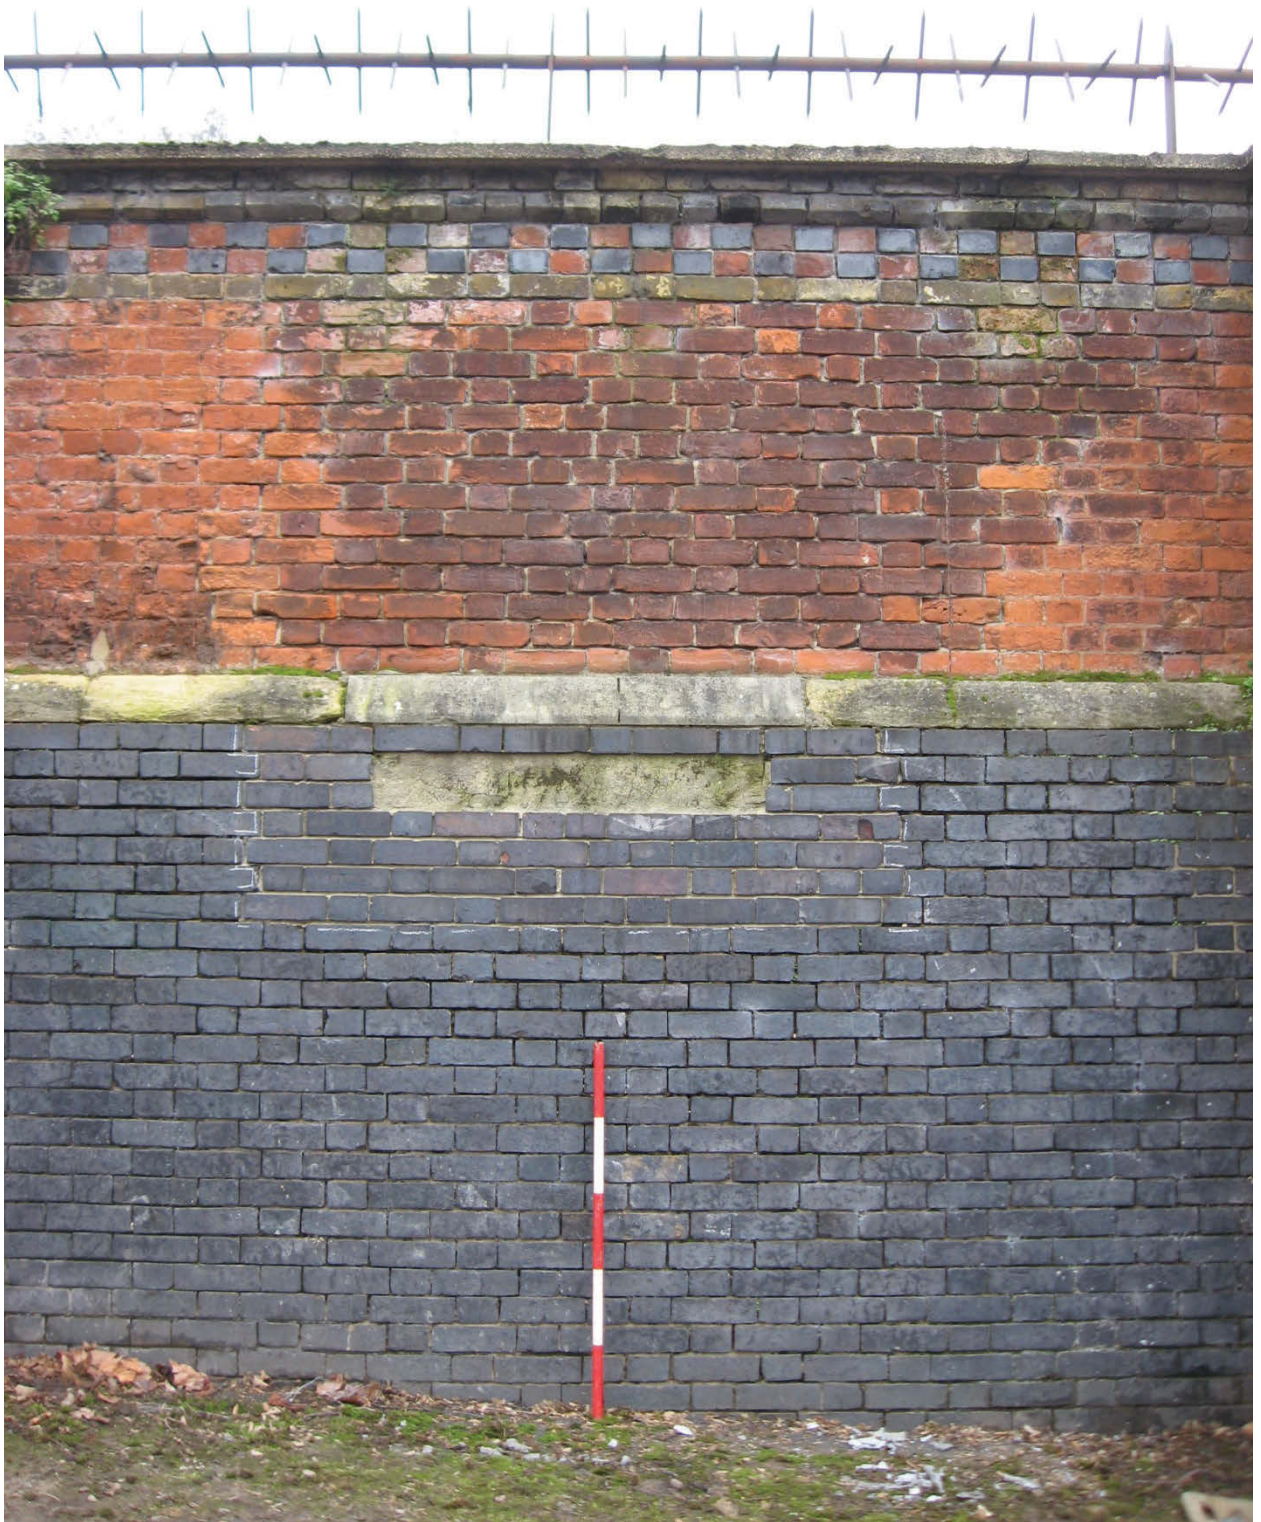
Blocked opening in the south elevation of the church to the north of wall 48, looking north
